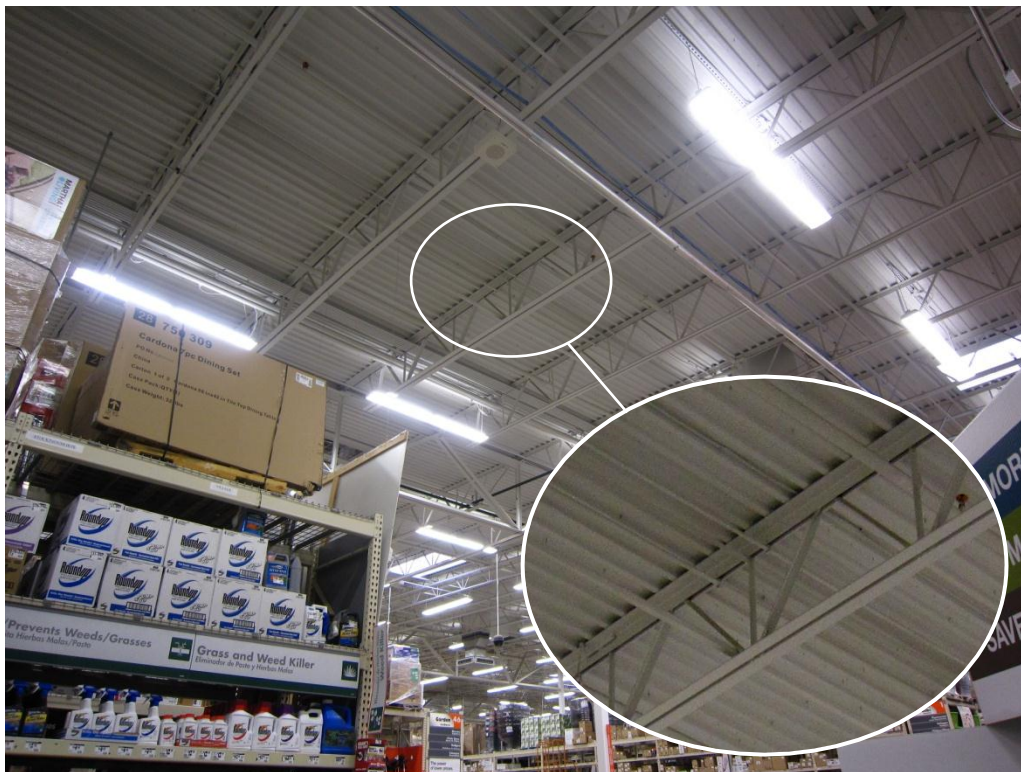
Open web steel joist consisting of double angled chord members and crimped single angled web members with vertical elements (Building 3).
